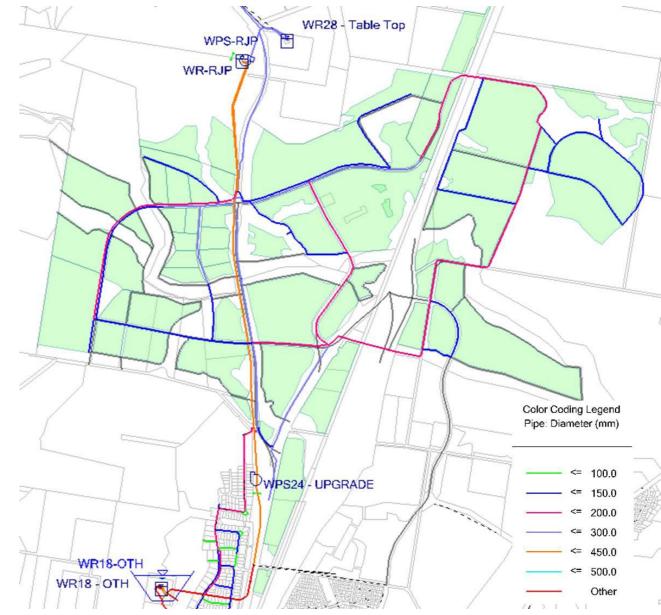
Proposed Water Reticulation Network - New and Existing Pipes (SMEC, 2022, p 67)
